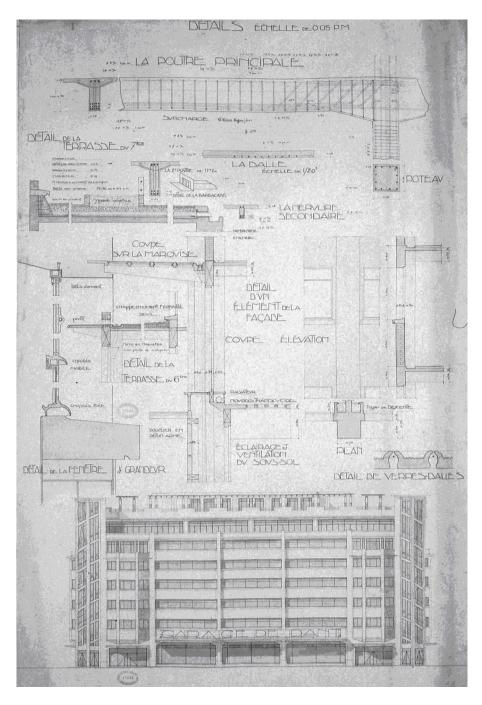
Borie, "concours de construction générale" 1928: a car garage. Facade and details (BENSBA, CG 367)
